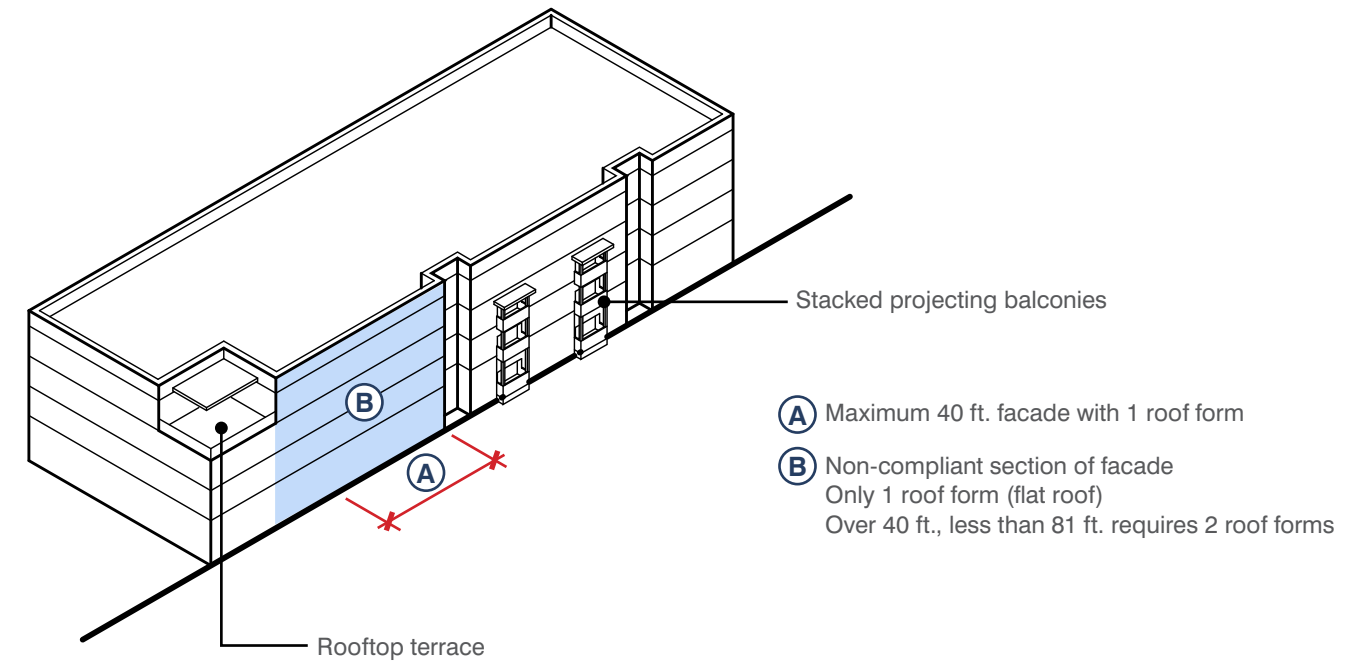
BUILDING FACADE WITH NON-COMPLIANT SECTION
